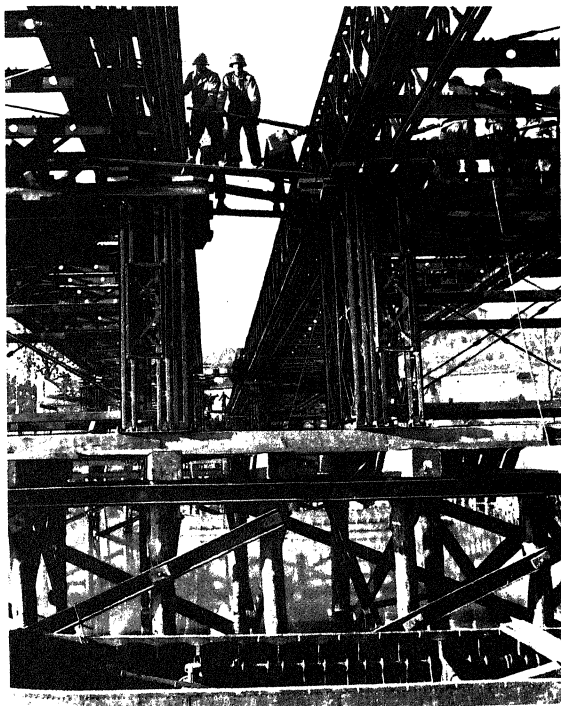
Two panel bridges being jacked down onto panel crib piers.
